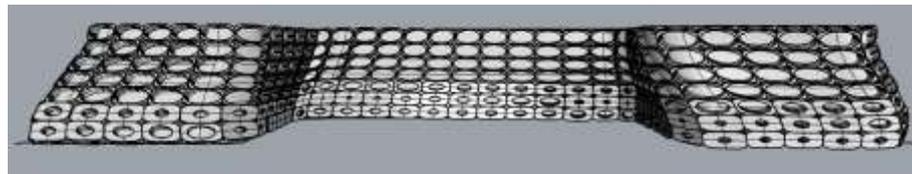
Layout 3- U Shaped Plan Building, Parametric Curvilinear Form
